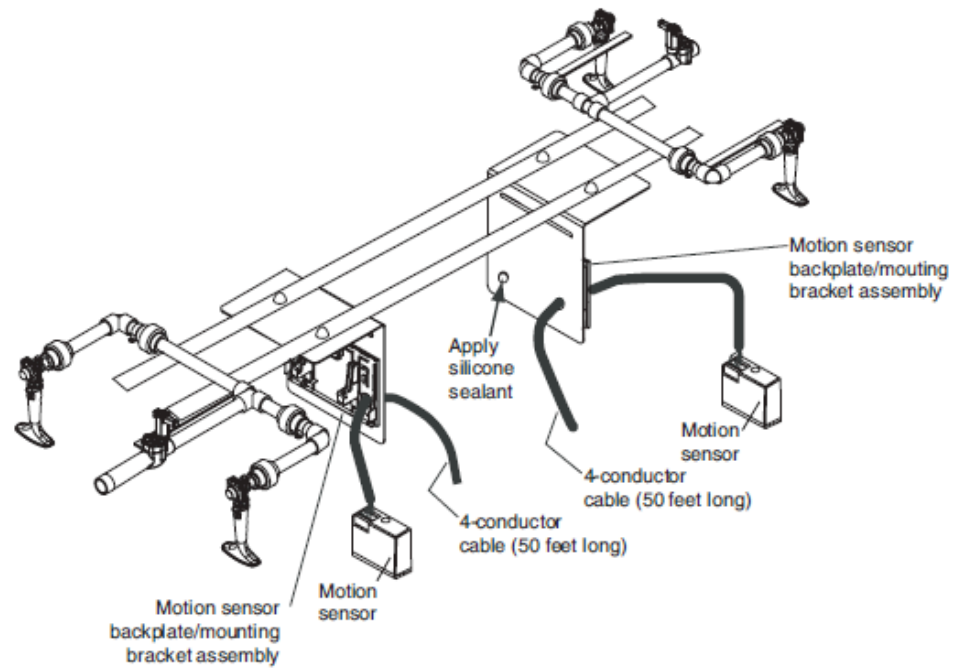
Pulling 4-conductor cable through the motion sensor mounting bracket/backplate.
